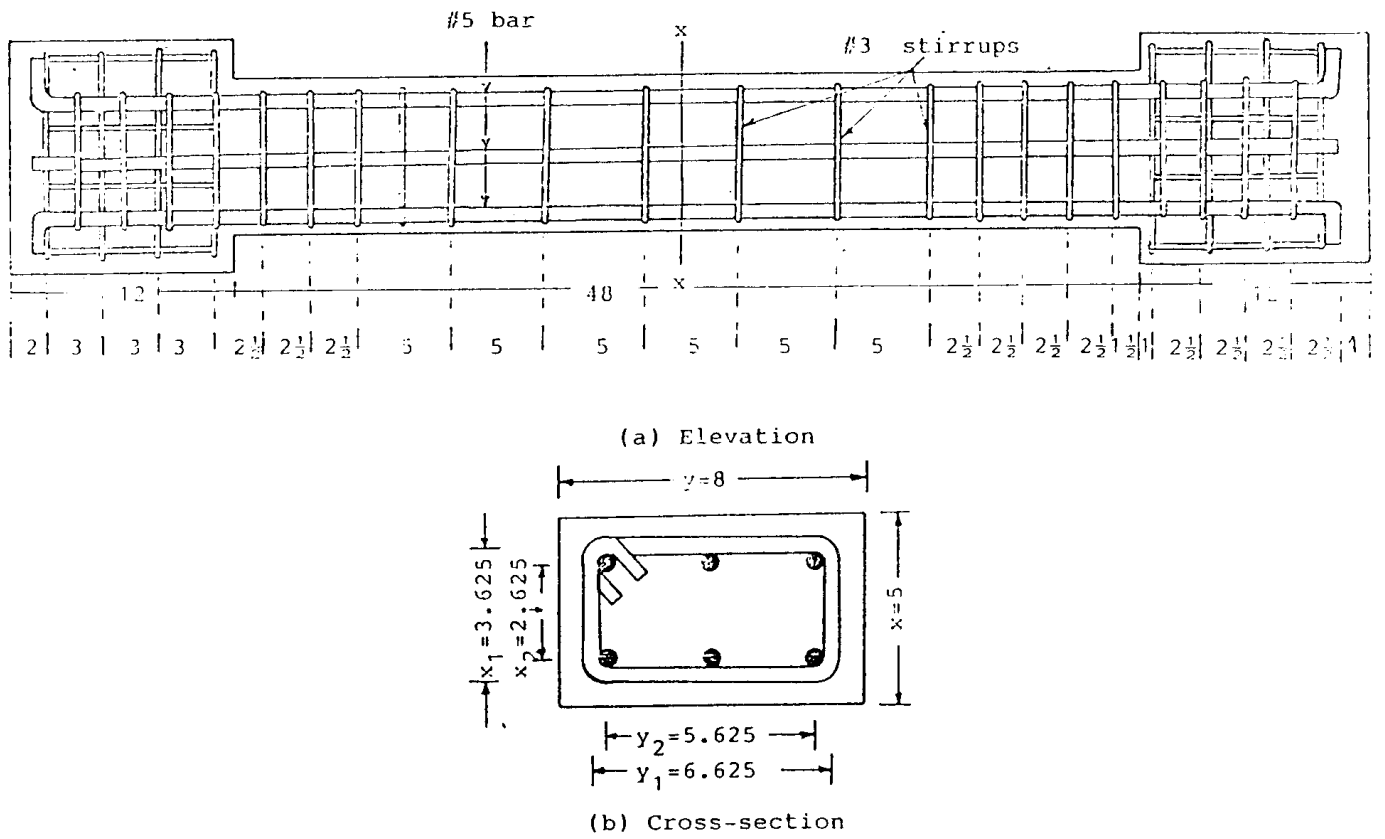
Reinforcement details of rectangular column (all dimensions are in inches)
